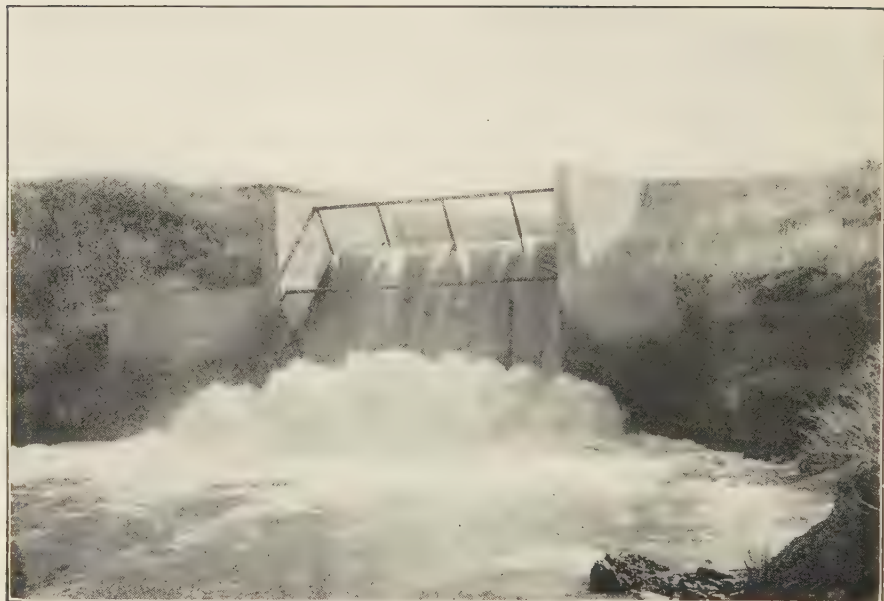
FIG. C.—Fifteen and one-half foot plain concrete drop. Modesto Irrigation District, Calif.
